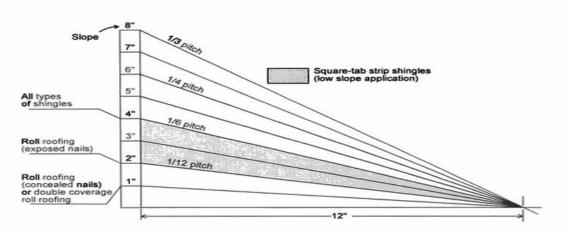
Minimum pitch and slope requirements for various asphalt roof products [1]
